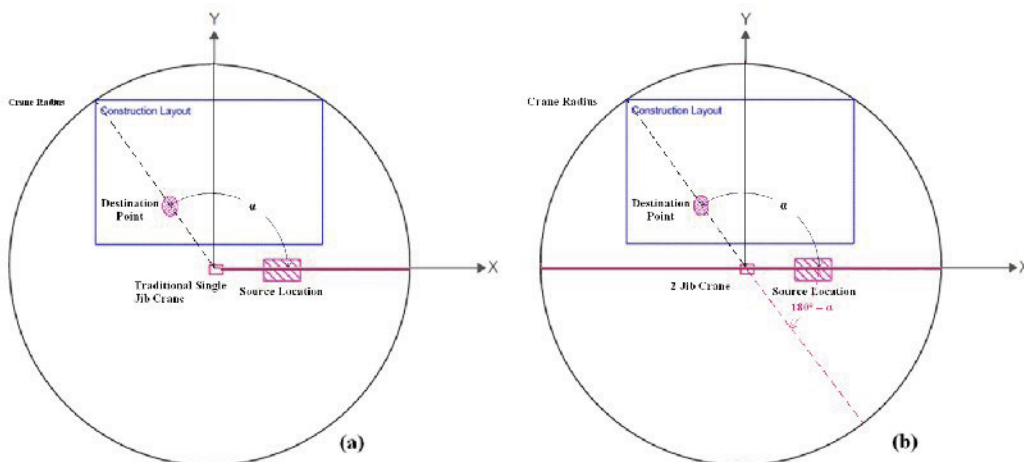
(a) Traditional Tower Crane, (b) Double Jib Tower Crane
